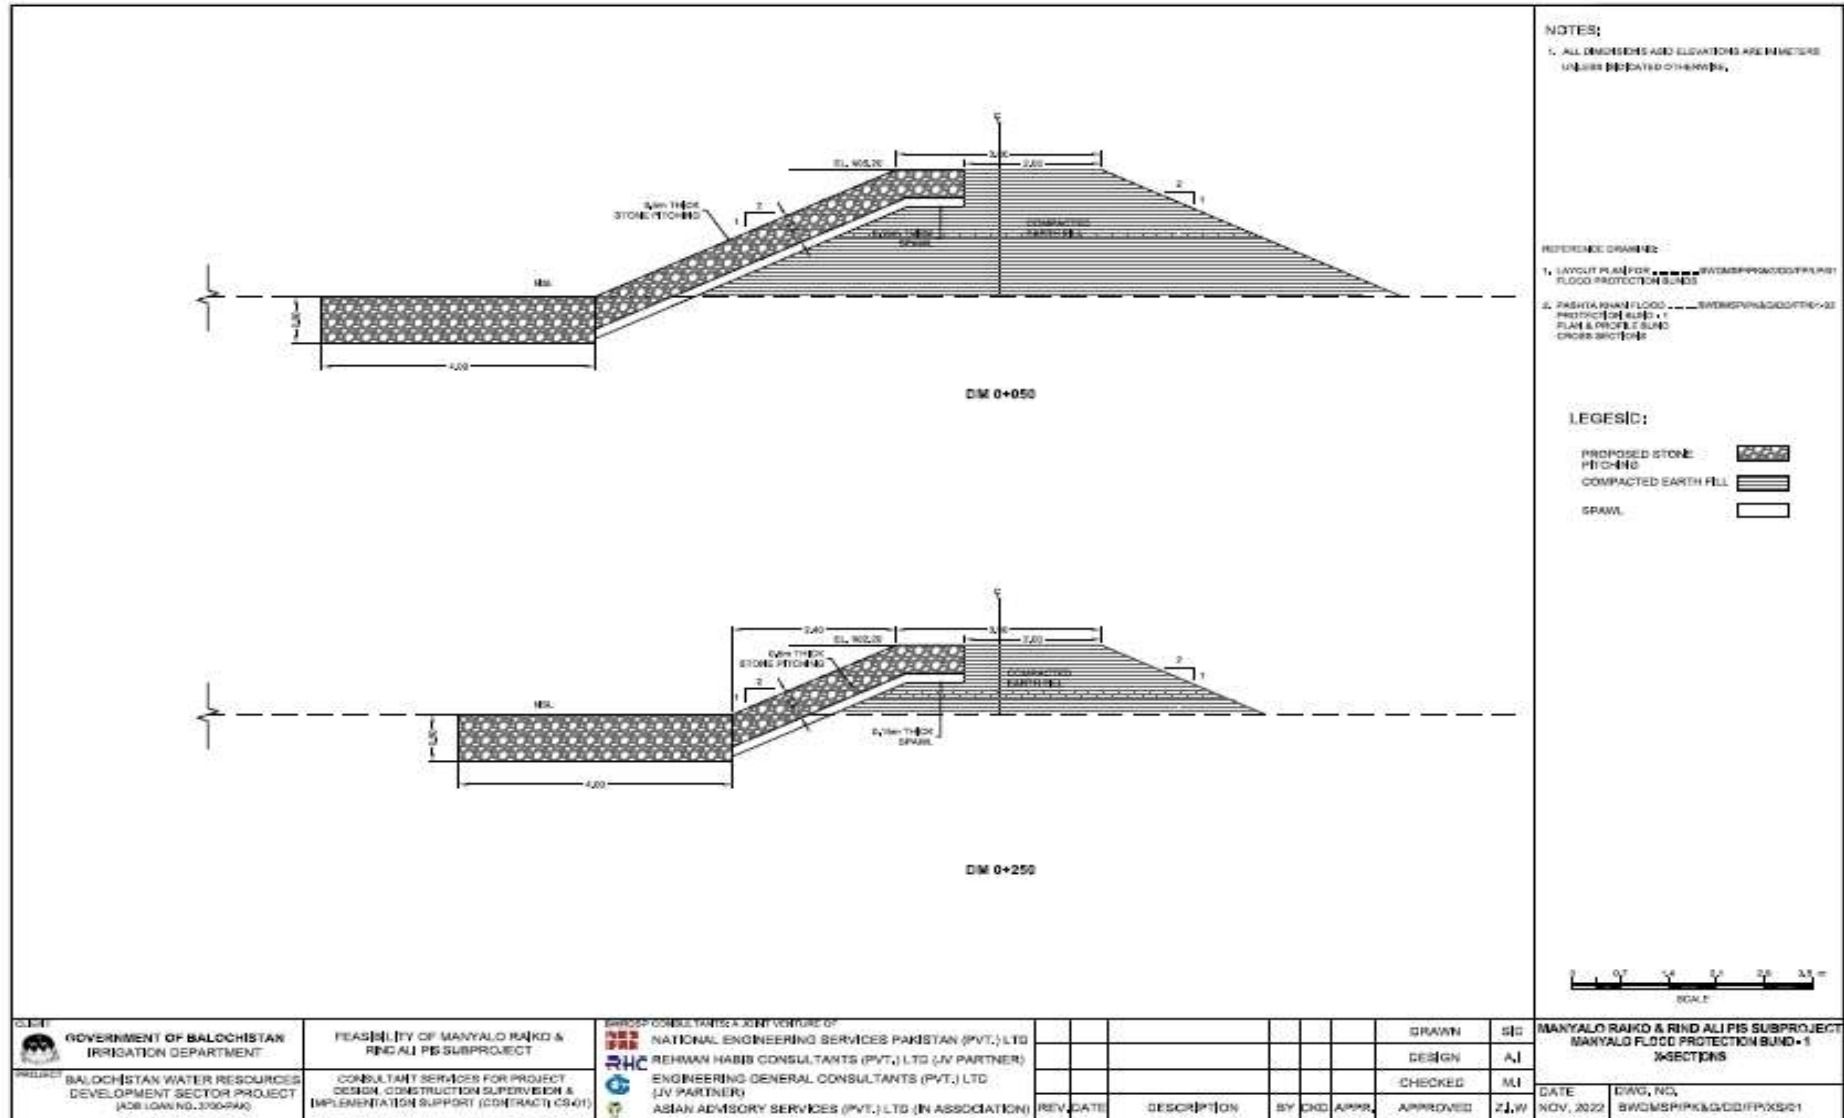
Cross Section of Manyalo Flood Protection Bund
